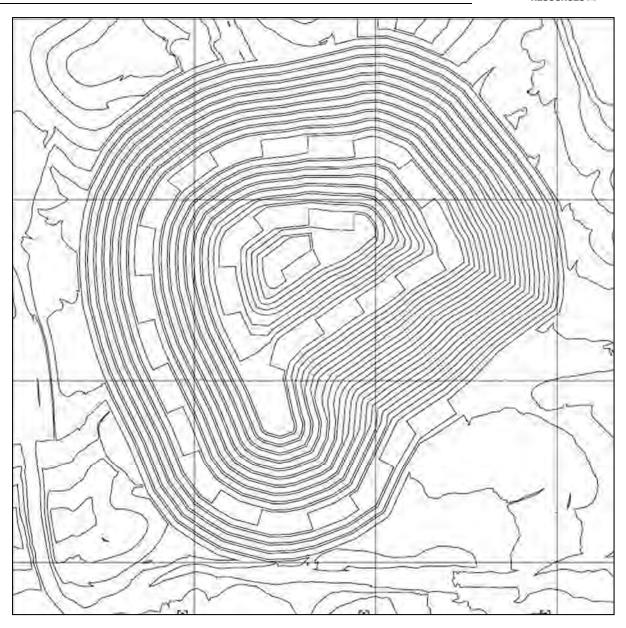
Final Pit Design for Mine Plan and Mineral Reserve
